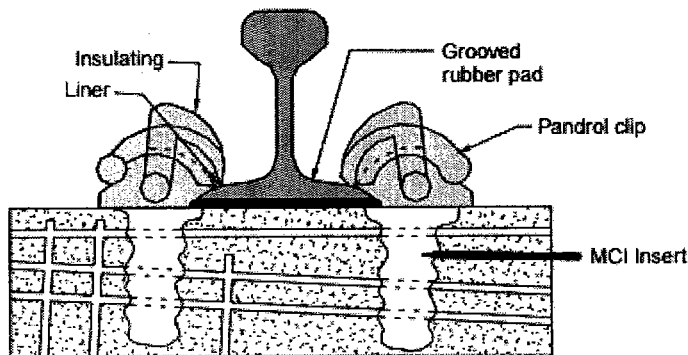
Details at rail seat of a prestressed concrete sleeper
